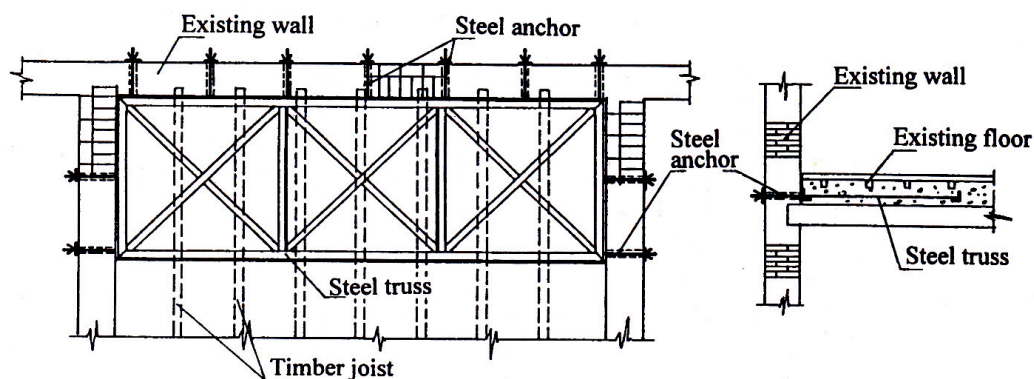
Bracing of a large-span wooden floor with metallic truss [21]
